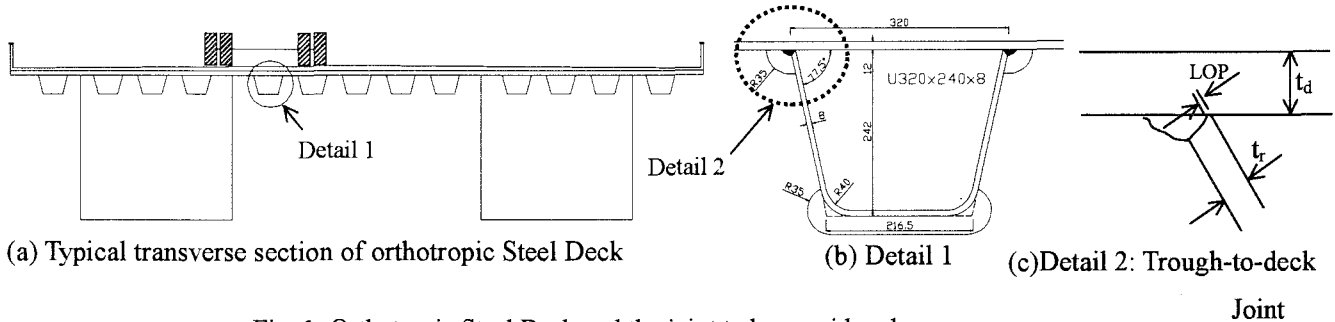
Orthotropic Steel Deck and the joint to be considered
